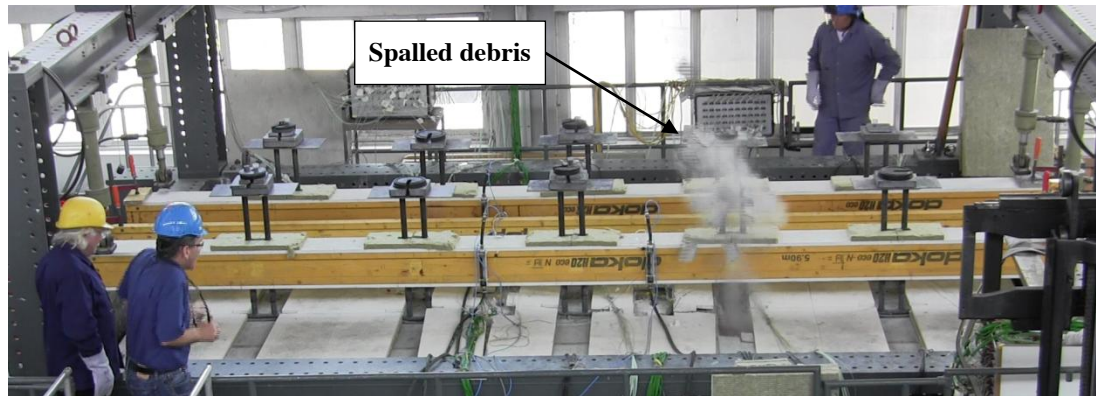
Heat-induced concrete spalling and immediate collapse of a slab, 12 min from the start of the test.
